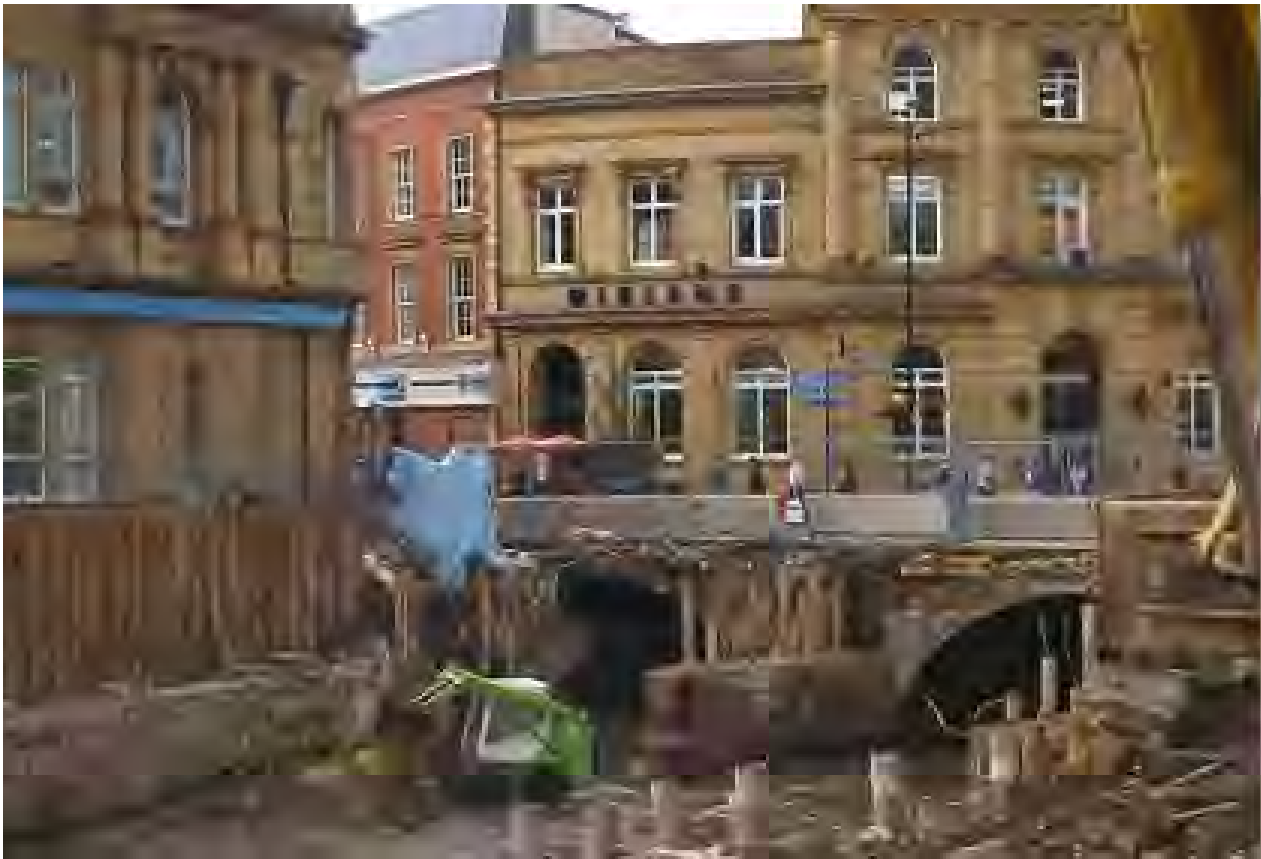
, 4.29, 4.30 Wigan Pier 2014
